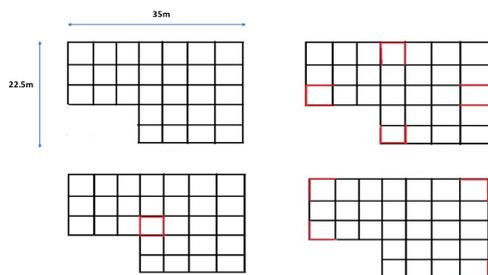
Plan of Different Shear Wall Positions in Irregular Buildings
